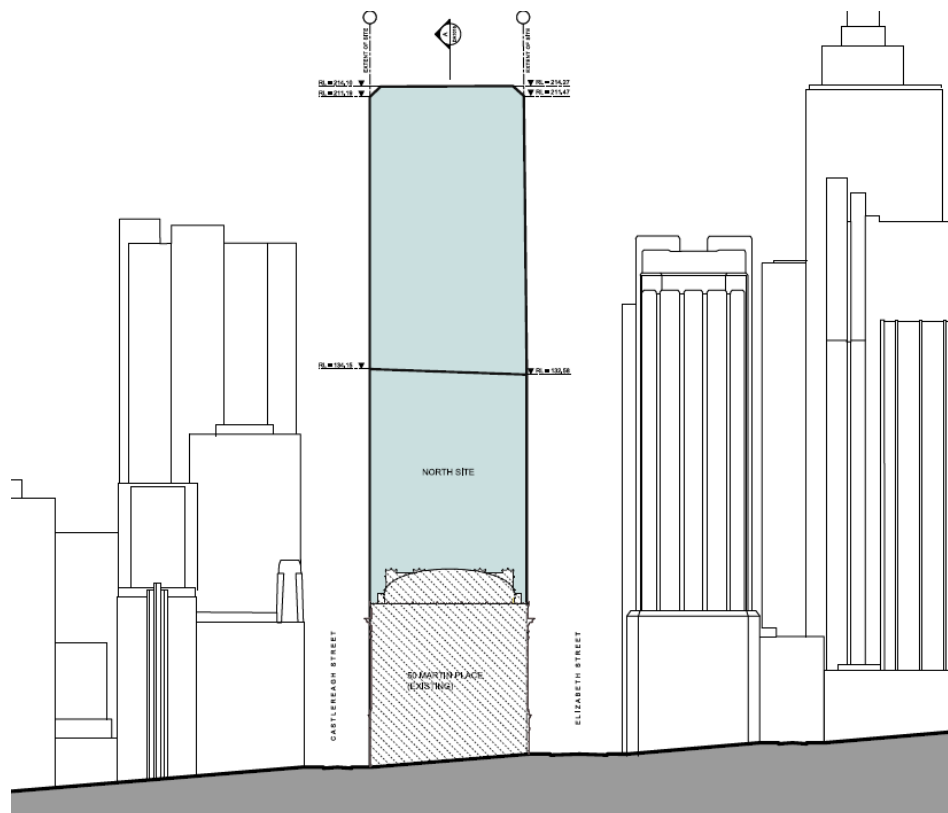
Proposed North OSD tower building envelope, east elevation
